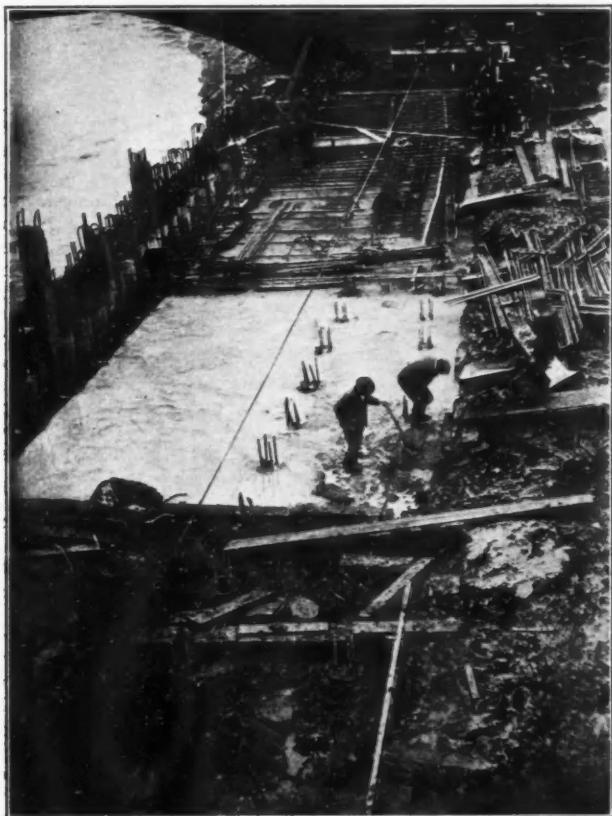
Reinforced concrete piles in river wall and bridge foundation.
